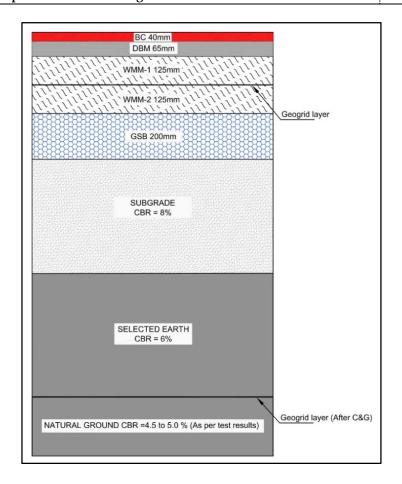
Flexible Pavement cross section with Geo grid provision
